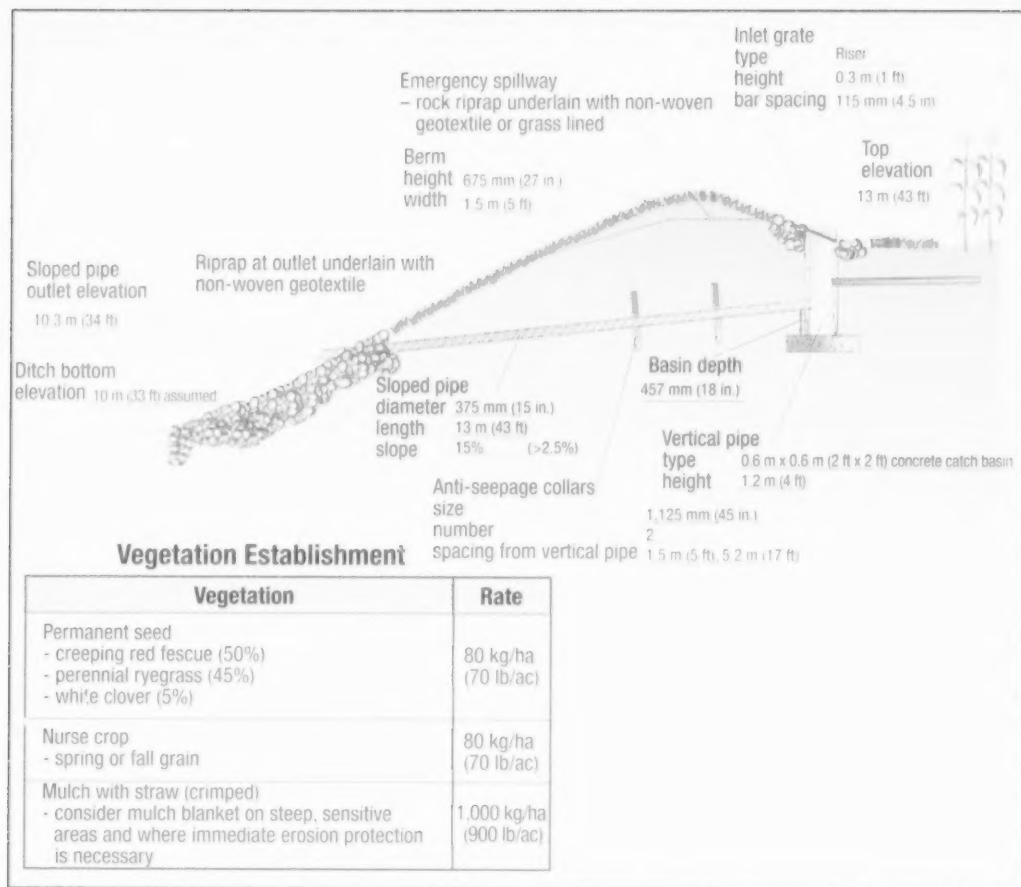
Sloped Pipe Structure – Example Problem #2
